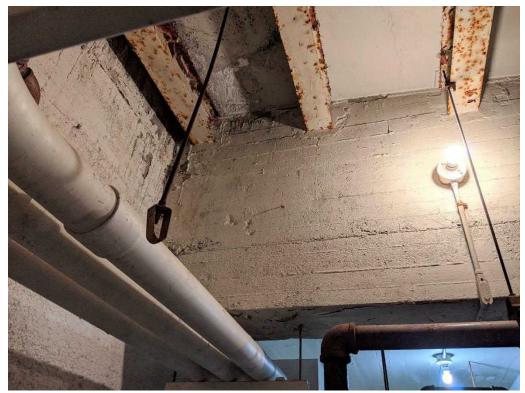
Looking South at Face of Concrete Beam at East End of Vault.
